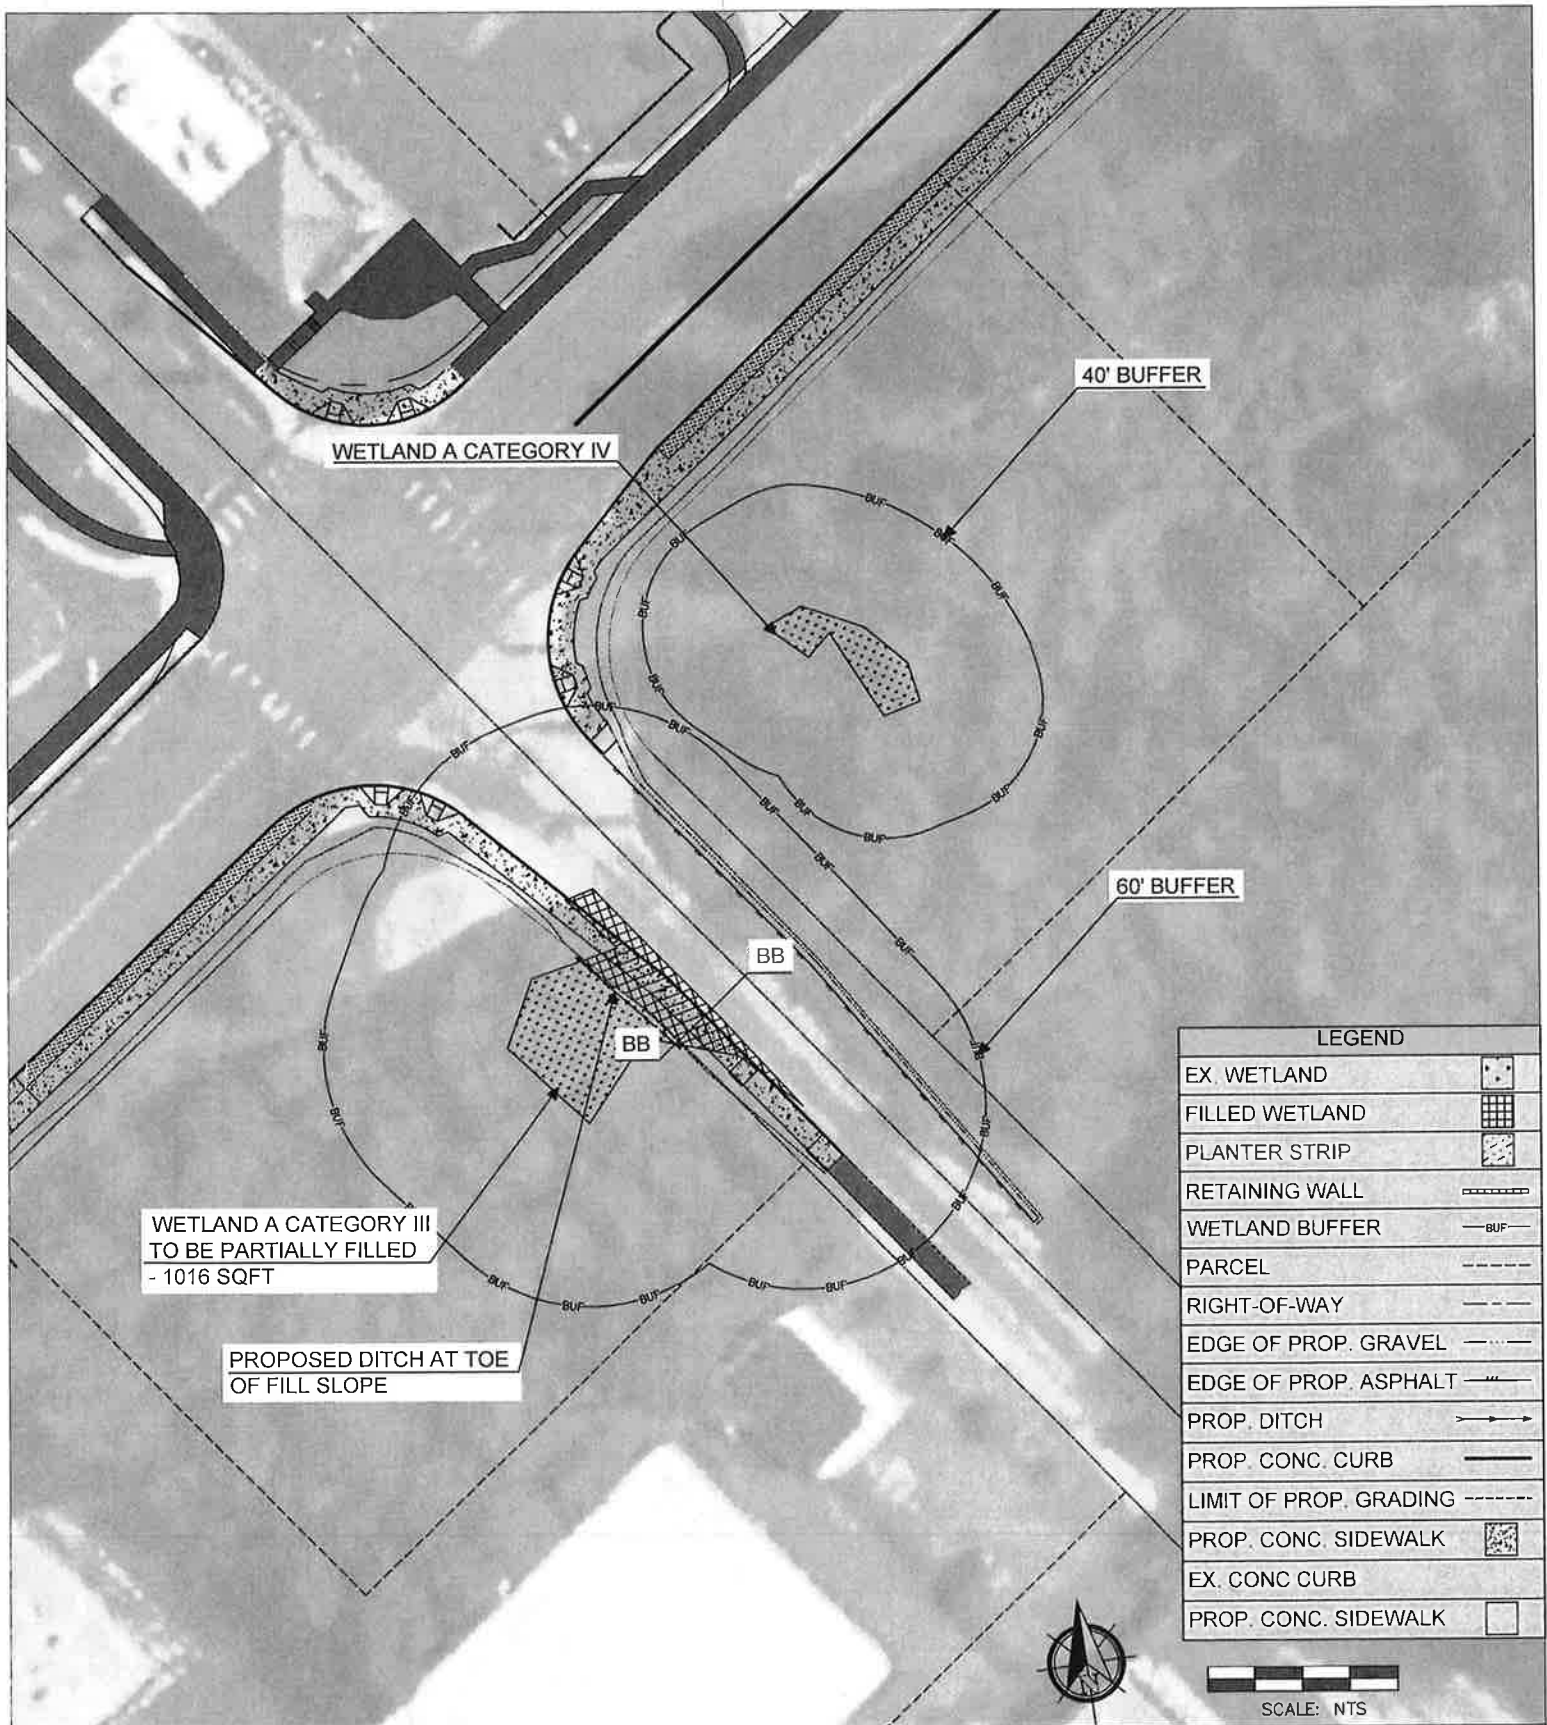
OFF SITE EXISTING CONDITIONS
